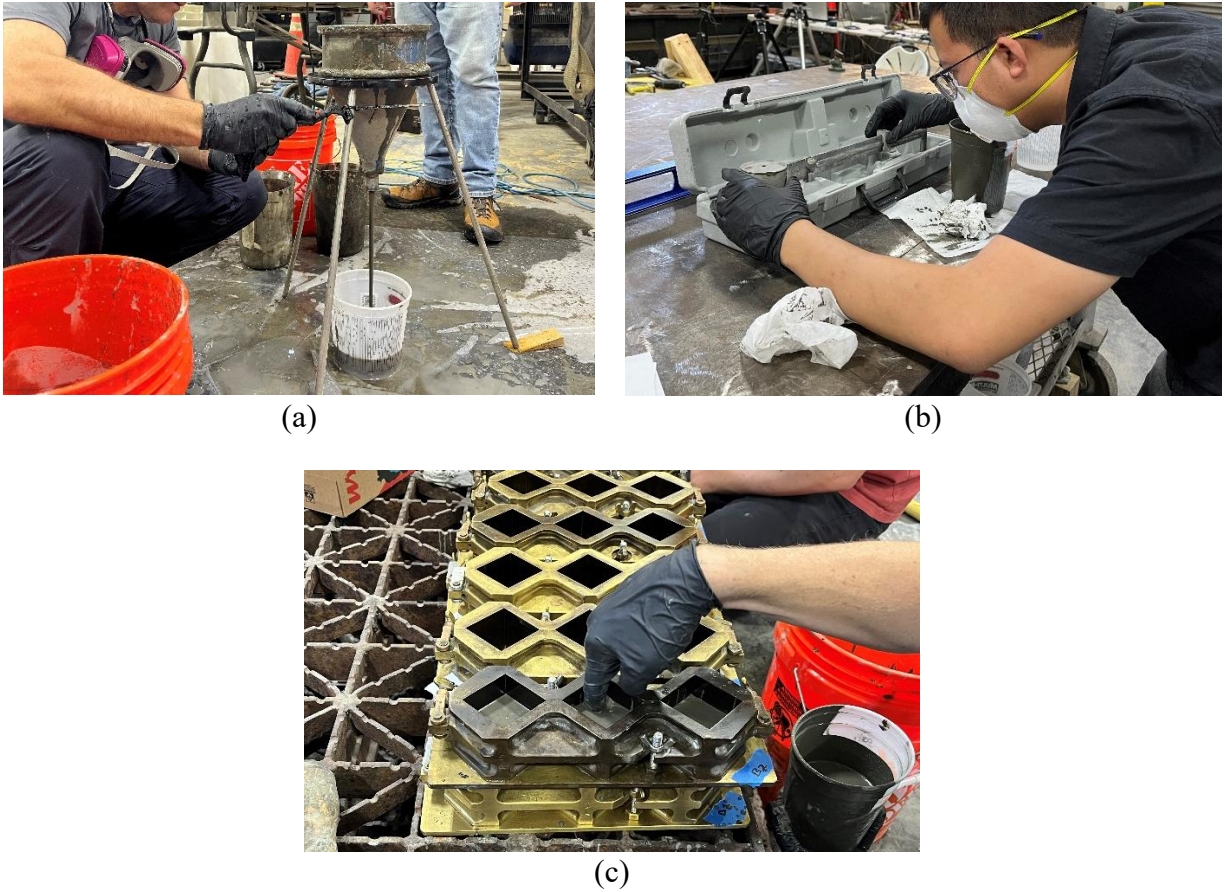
Laboratory tests and activities performed during grouting of beams: (a) Flow cone test; (b) Mud balance test; (c) Casting of grout cubes.
